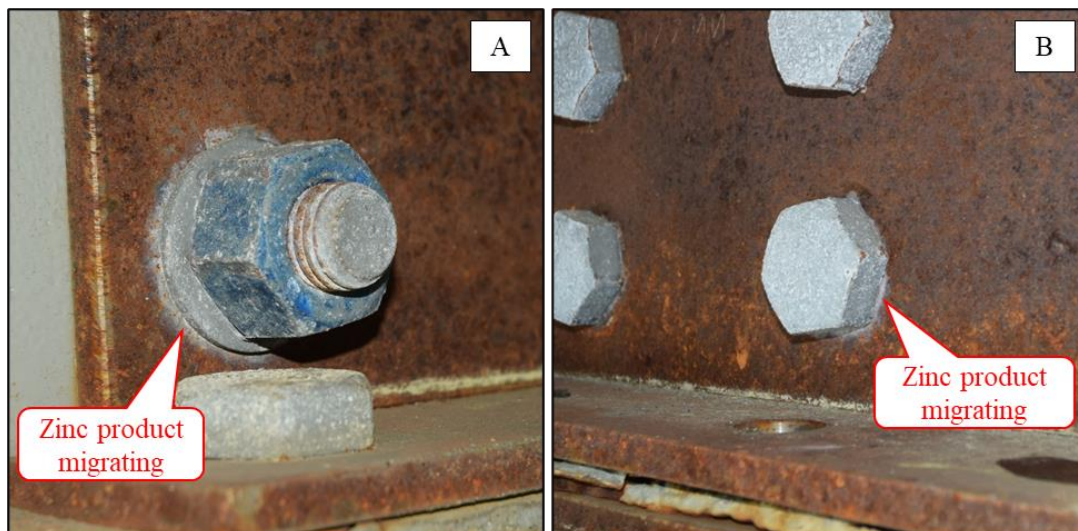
Close-Up Photographs of Bolted Repair Types 1 and 2 Made of 50CR Steel and Galvanized Fastener Assemblies on the Onancock Bridge Showing Zinc Product Migrating From the Galvanized Assembly to the 50CR Steel Plate: (A) nut and washer side of assembly; (b) bolt head side of assembly.
